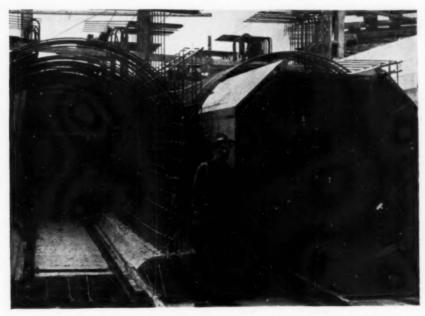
Shuttering and Reinforcement for Octagonal Culverts. April, 1952.
